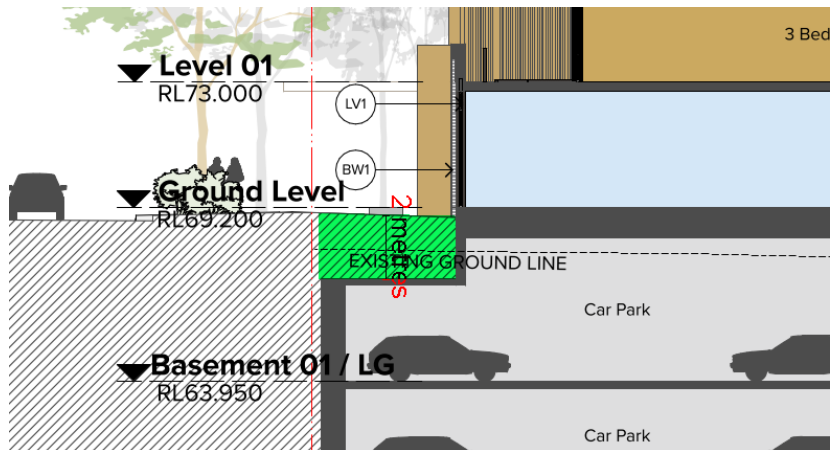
Cross-section showing the provision of deep soil within the setback area to Road 3.
